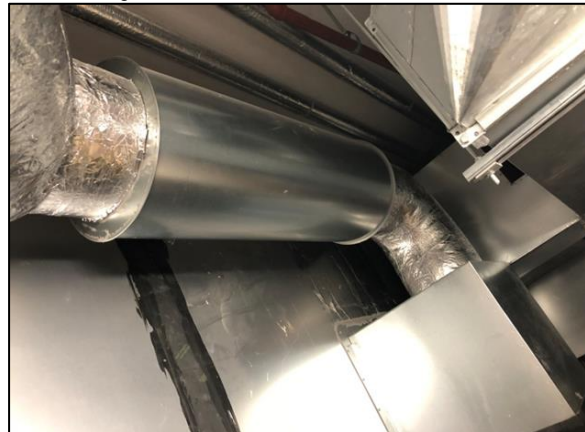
Atmospheric side attenuator installed on Extract fan - See Drawing L1975M004
